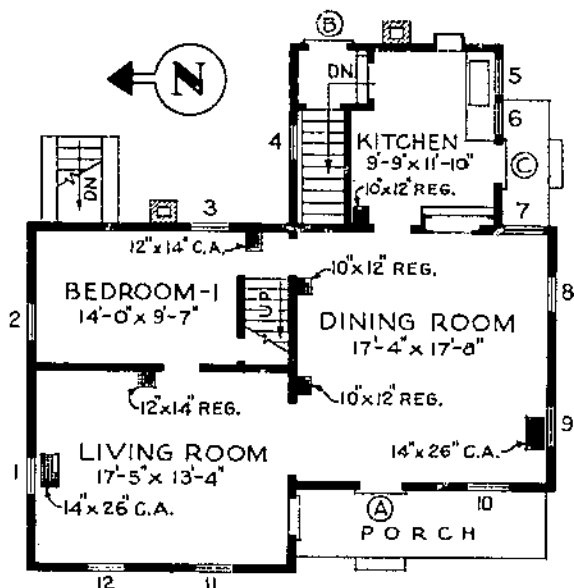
First-floor plan of house No. 5, showing location of warm-air registers and cold-air returns.
